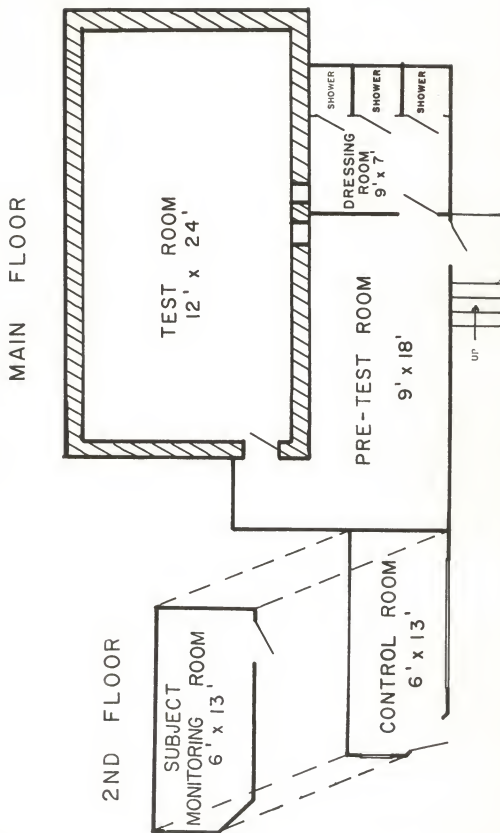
Floor plan of the KSU-ASHRAE Environmental Laboratory facility.
